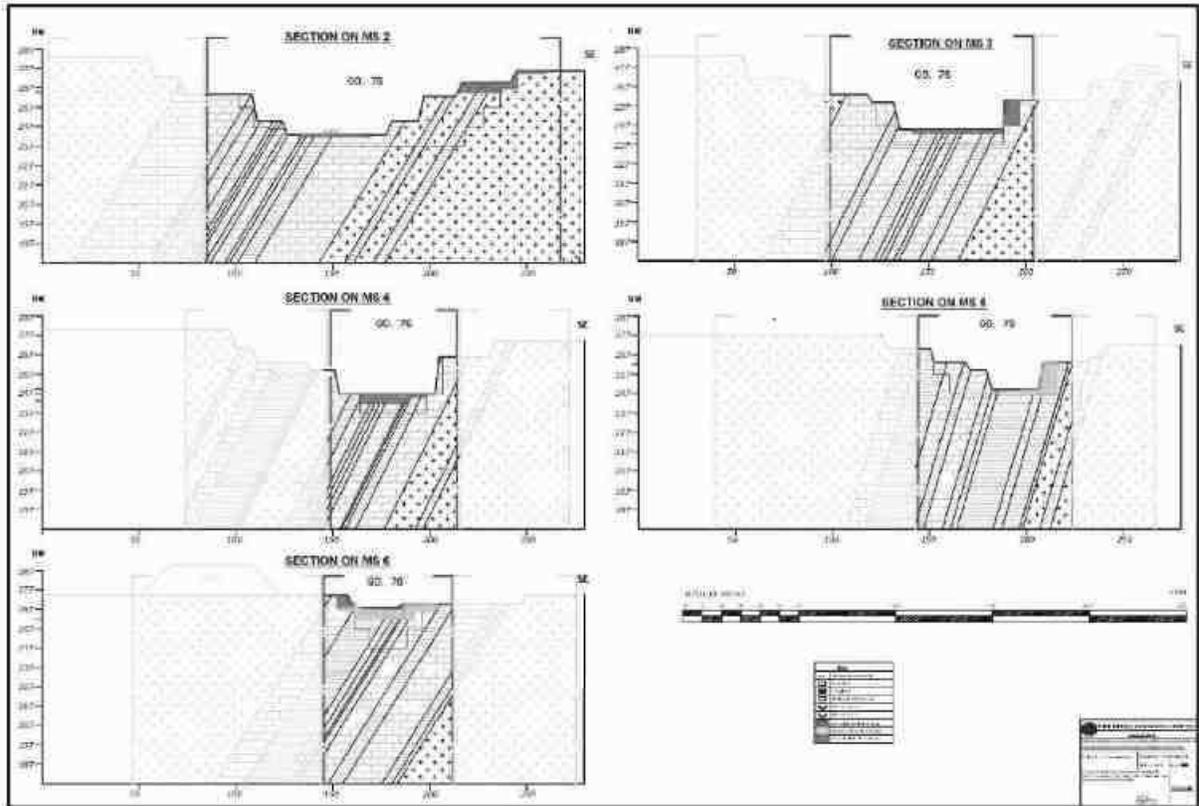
Mine Position at the end of Plan Period Cross Section- G.O.76
